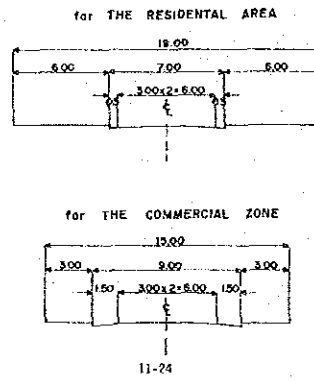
(2) Cross Section for the Streets Plan in Barranquilla
